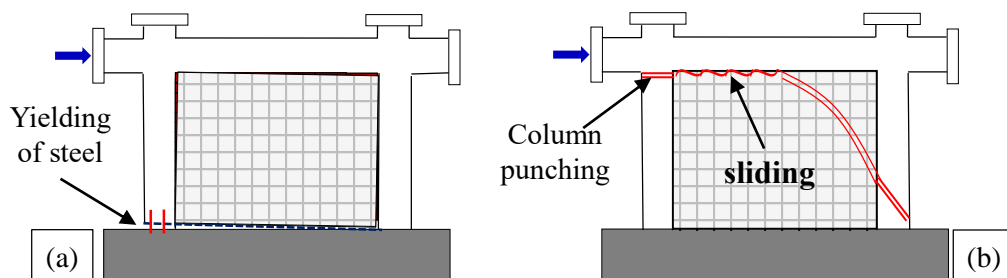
(a) Flexural failure and (b) Column punching and joint failure of FC laminated specimens
